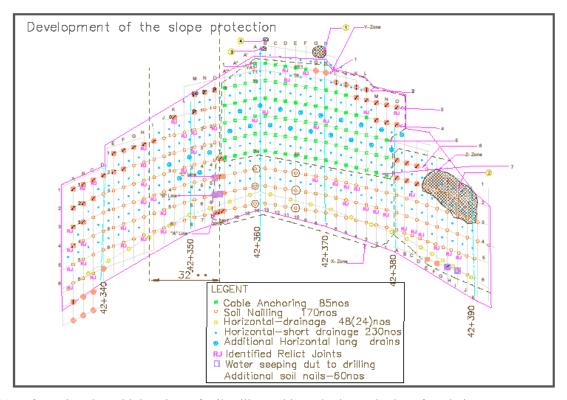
A front elevation with locations of soil nailing, cable anchoring and sub surface drains.
